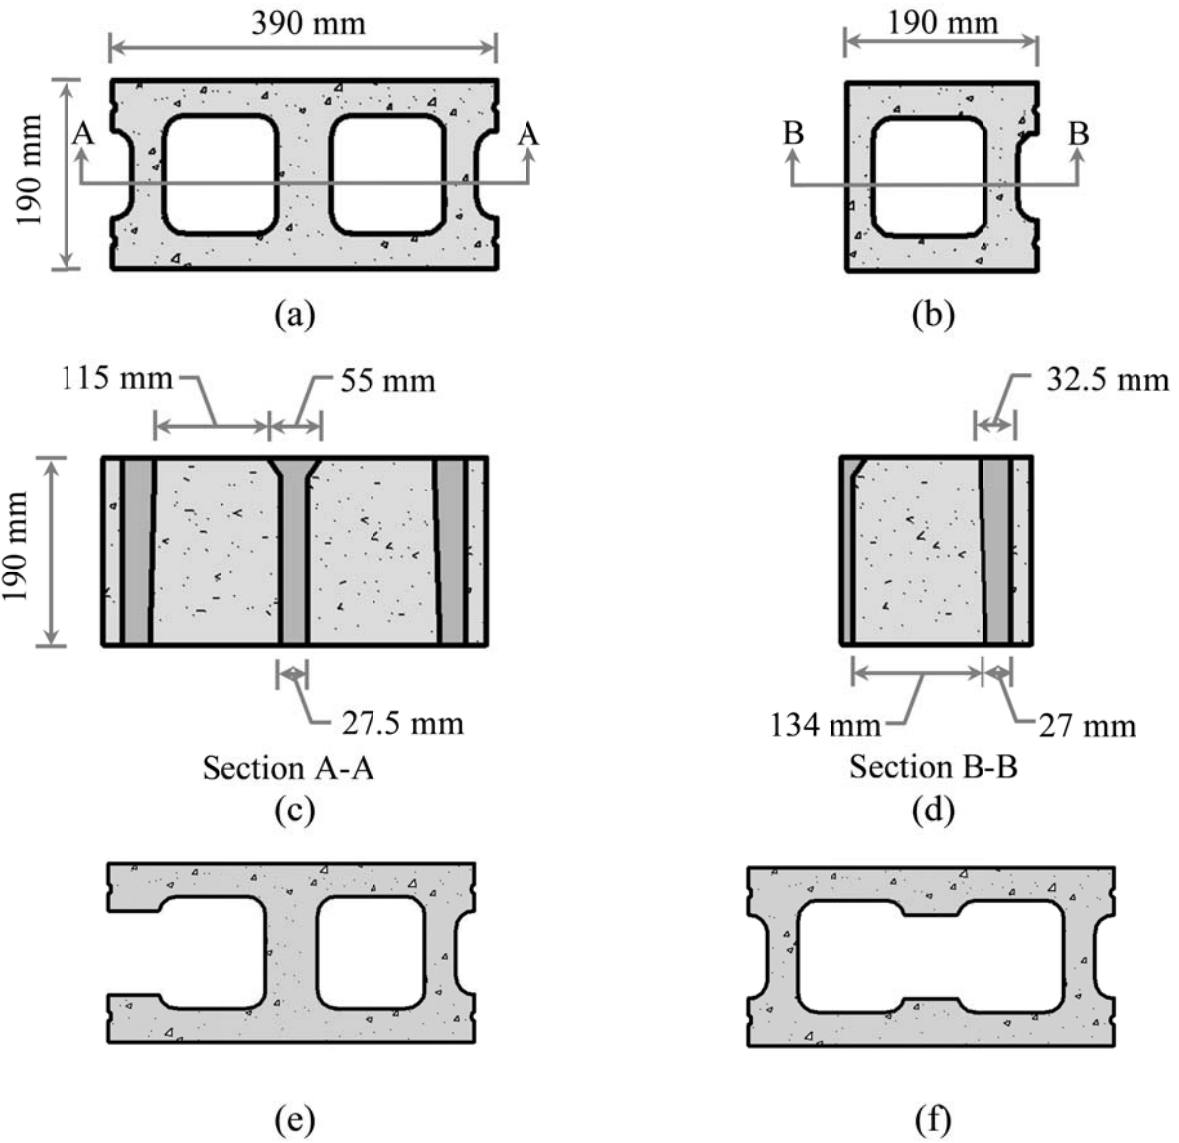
Concrete Masonry Units: (a) Standard Froged End Block, (b) Half Block, (c) Section of Standard Froged End Block, (d) Section of a Half Block, (e) Block with Exterior Knock-Out Web (A-Block), and (f) Block with Interior Knock-Out Web (O-Block).
